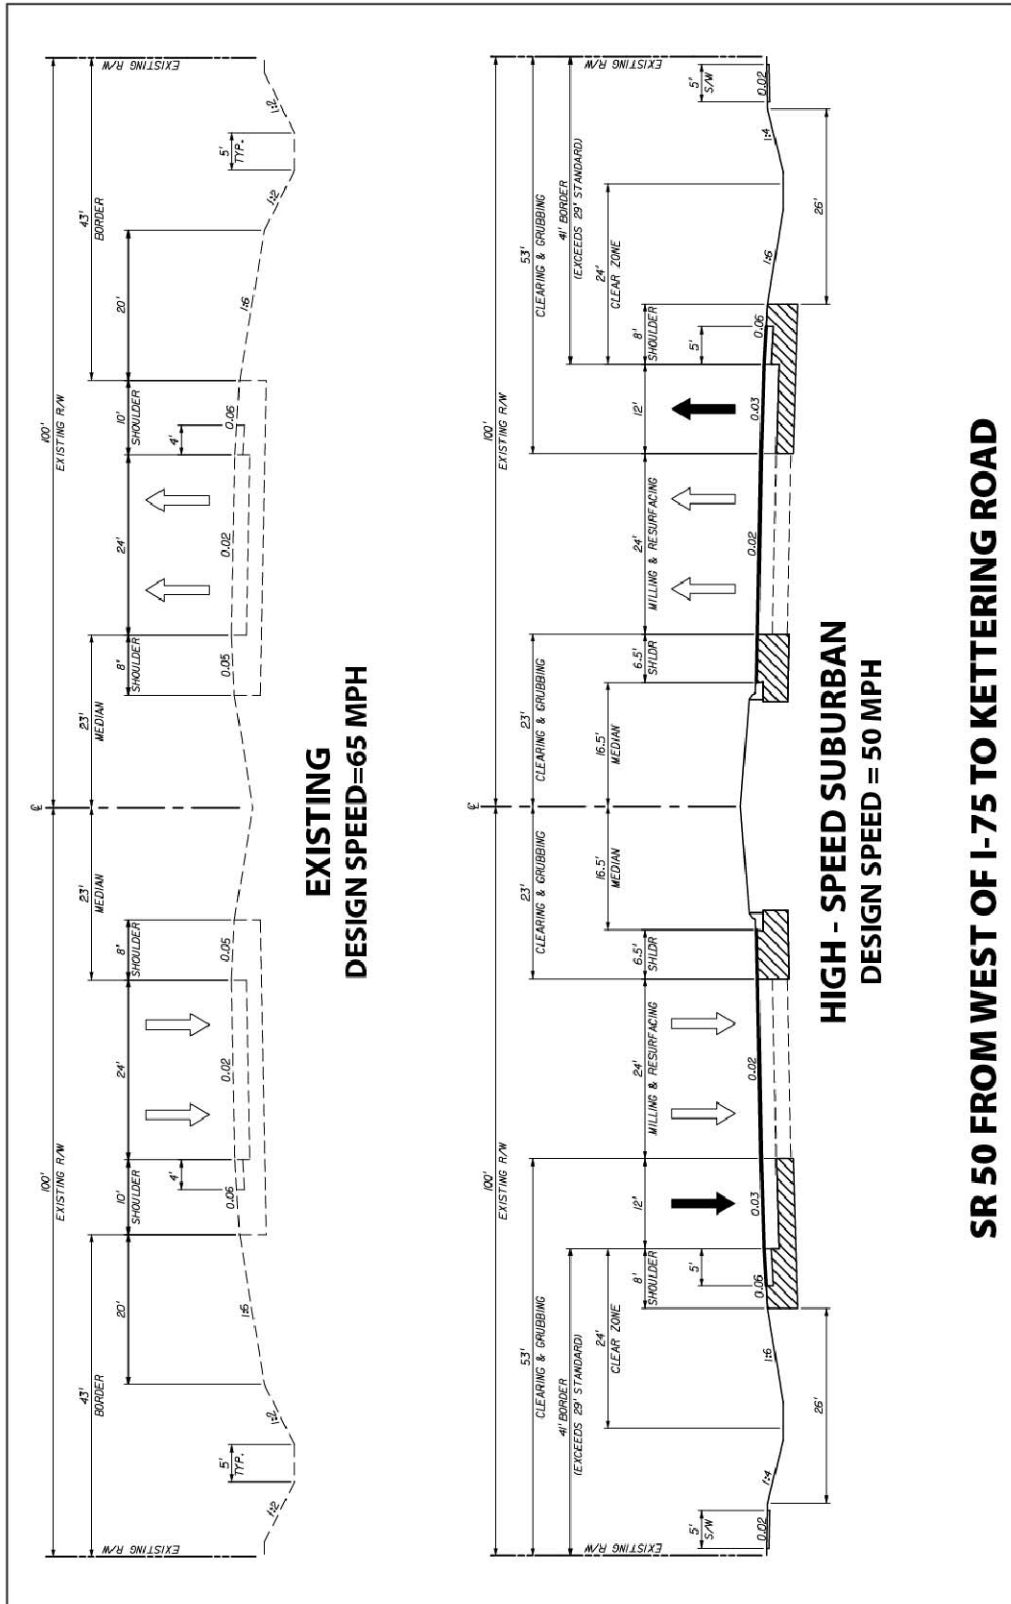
Proposed Typical Section from West of I-75 to Kettering Road
